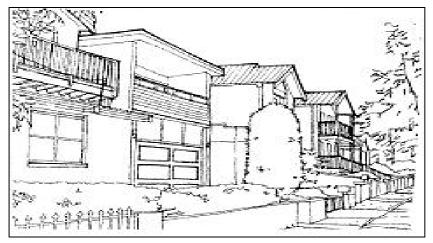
Balcony design should be compatible with the building's design instead of merely copying the adjacent style.
